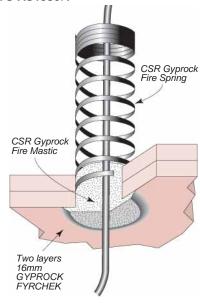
GYPROCK FIRE SPRING FITTED AFTER CEILING INSTALLATION TESTED TO AS1530.4
